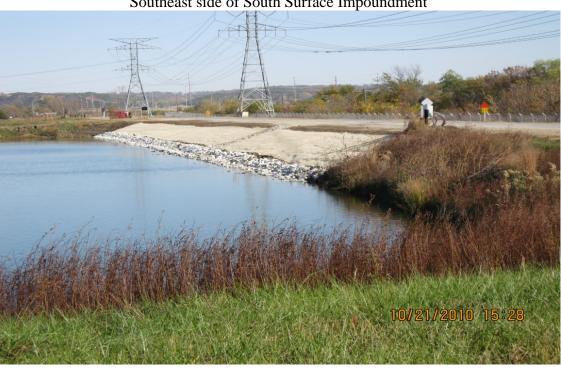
Placed rip-rap to protect wave erosion action Southeast side of South Surface Impoundment
